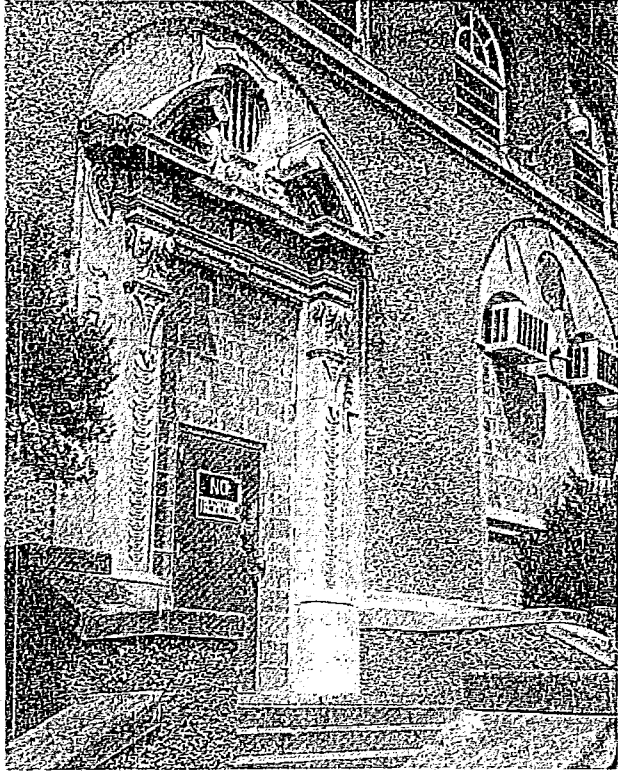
First floor openings have been filled with cinderblocks and doors, window sash and frames have been removed for safe keeping. Note the security light over the windows and the use of a security metal door with heavy duty locks. Photo: H. Ward Jandl, NPS.
